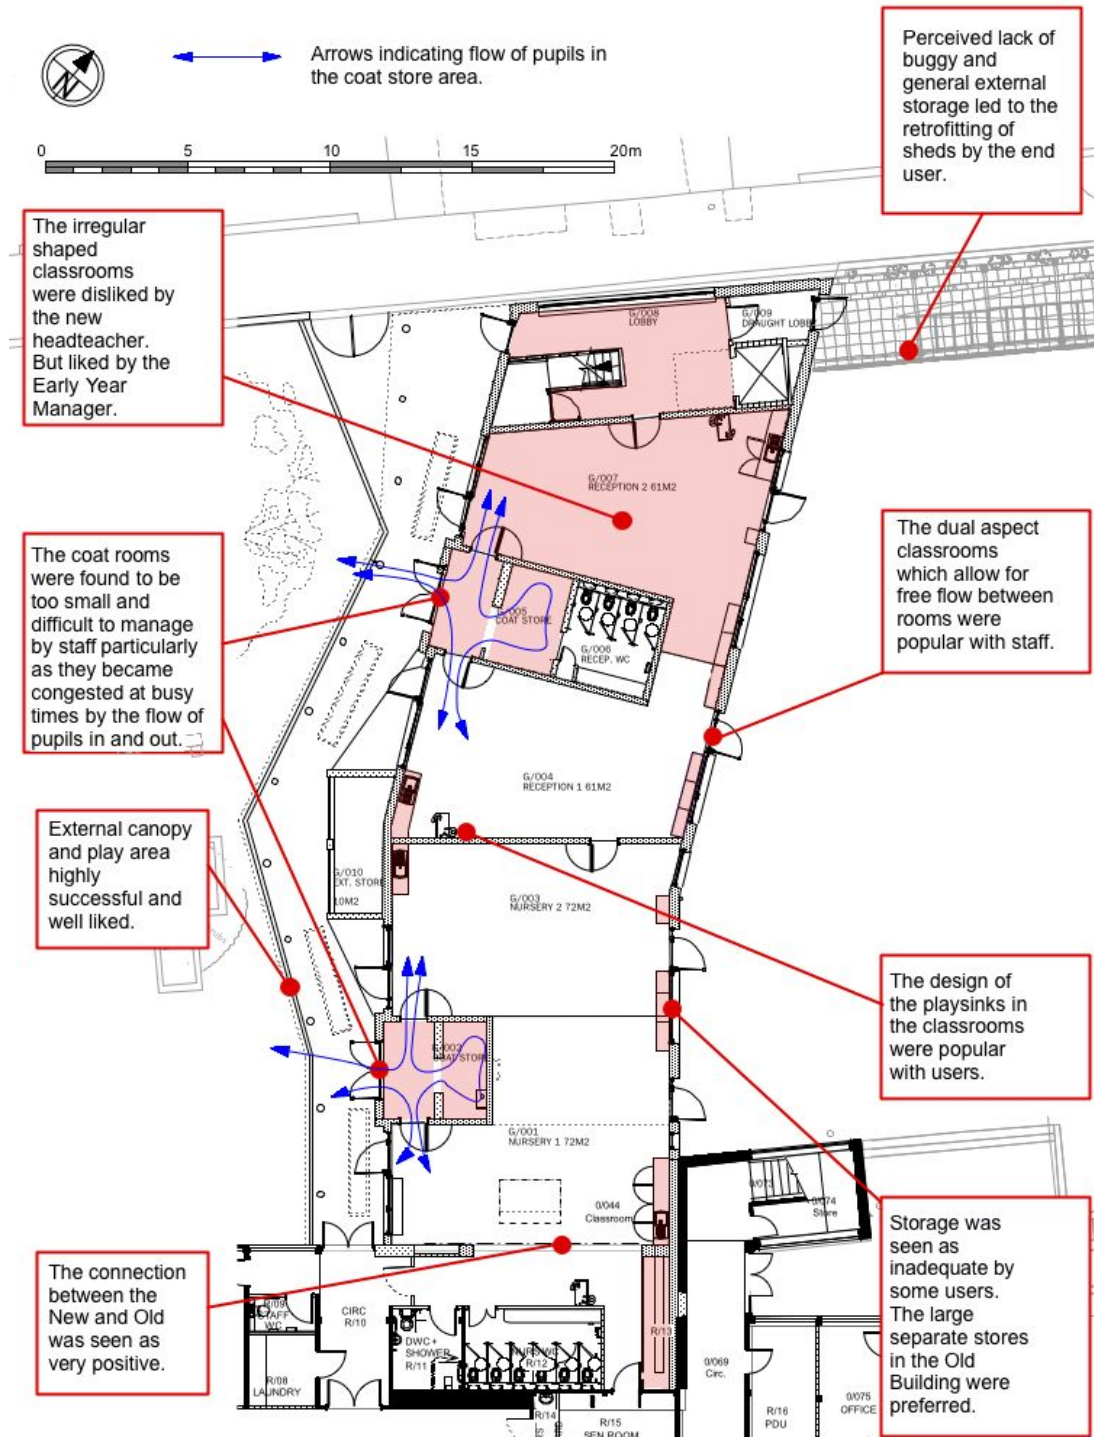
Ground Floor Plan of the New Building with commentary
